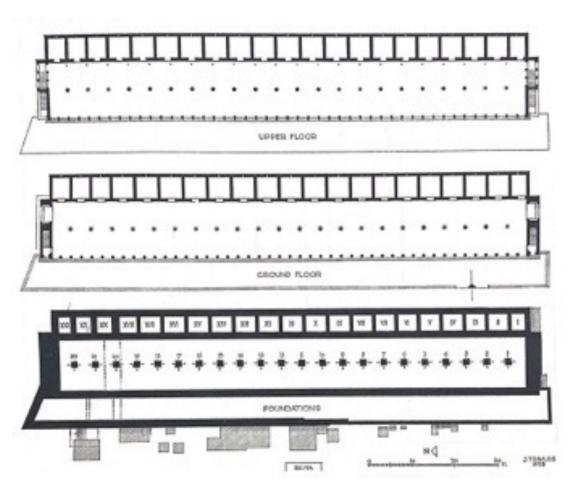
Foundation, Ground and Upper floor plans of the 'Stoa of Attalos'
